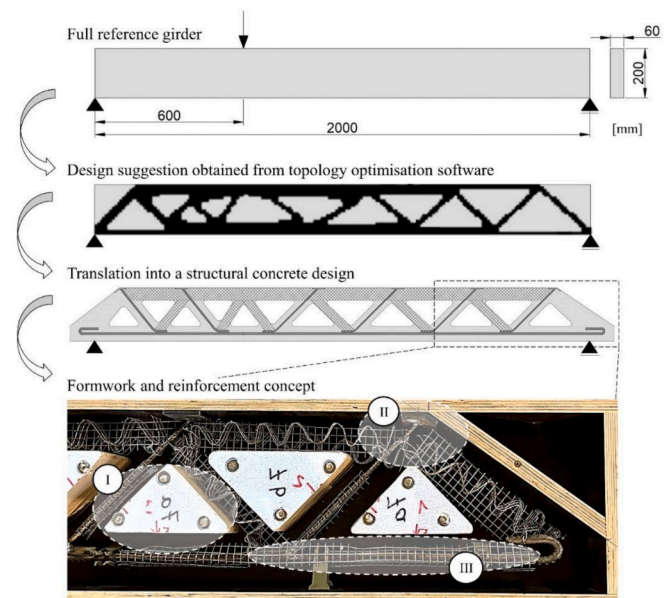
Overview of development stages of a topology-optimised concrete girder with a detail of the formwork and reinforcement concept (I – void formwork elements produced with a CNC milling machine that are screwed onto the base formwork plate, II – conventional reinforcing bars welded to a steel plate shaped according to the outer edge of the girder, III – fine steel mesh wrapped around the main tensile reinforcement).
